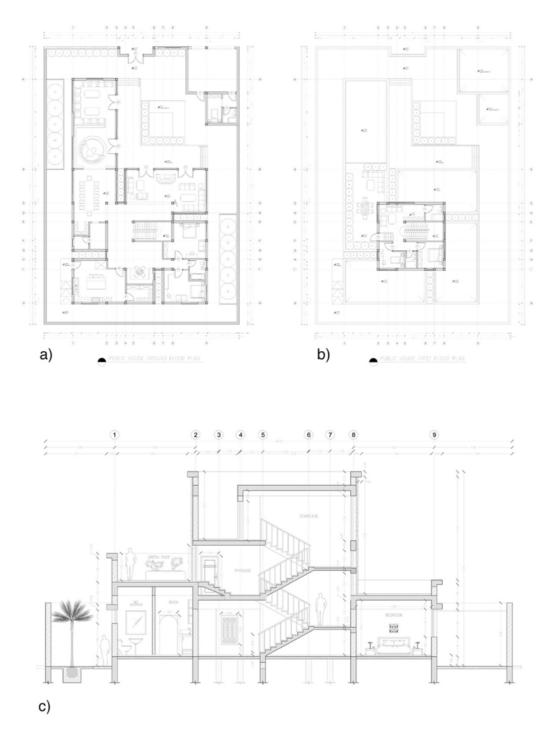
Architectural drawing of the house's a) Ground Floor Plan, b) First Floor Plan, and c) Section Plan (all plans are not to scale) (Al-Mohannadi, 2016).
